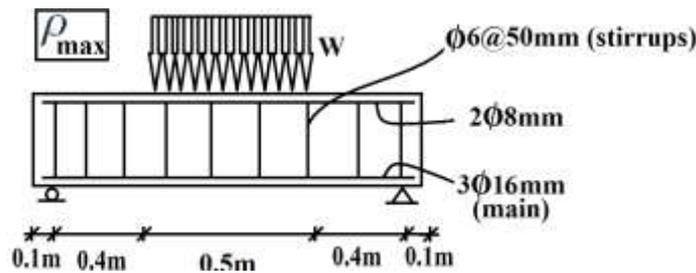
Reinforcement, geometry and loading of the beam Dist-max
